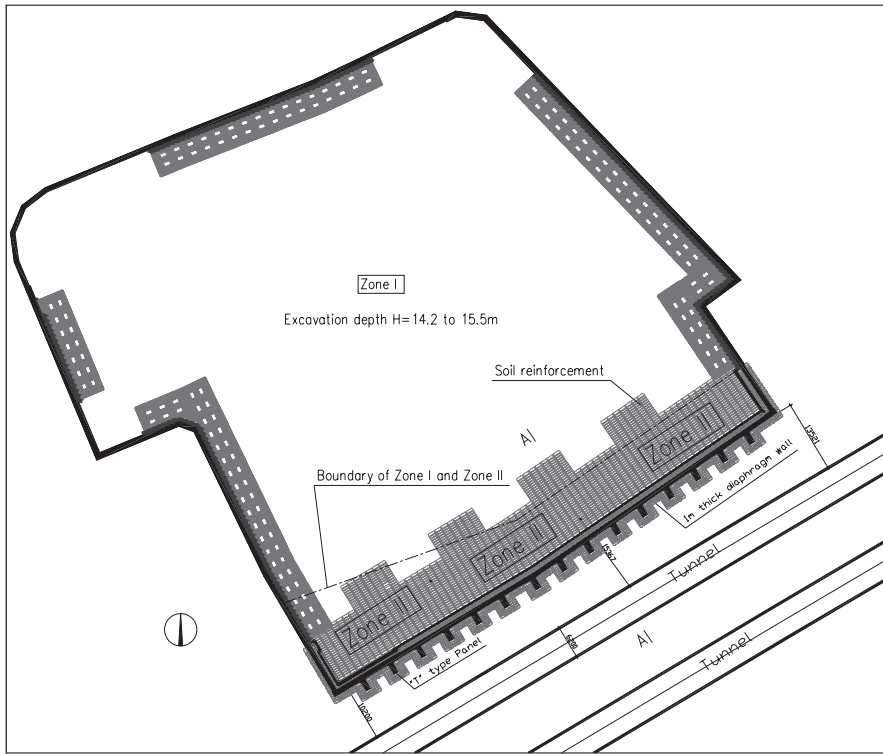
Layout of the reinforcement of the excavation of the Nanjing West Road Block project.
